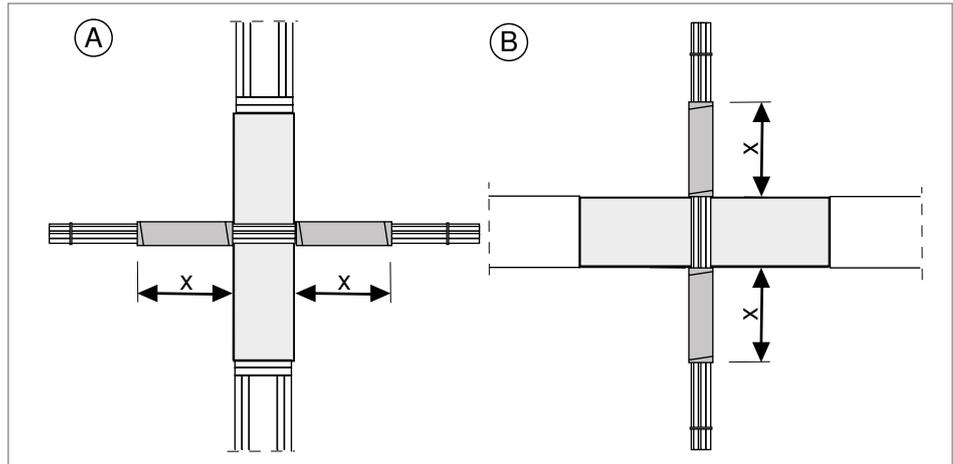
Measure: FSB-WB 1.5 fire protection coil in wall A and ceiling B
